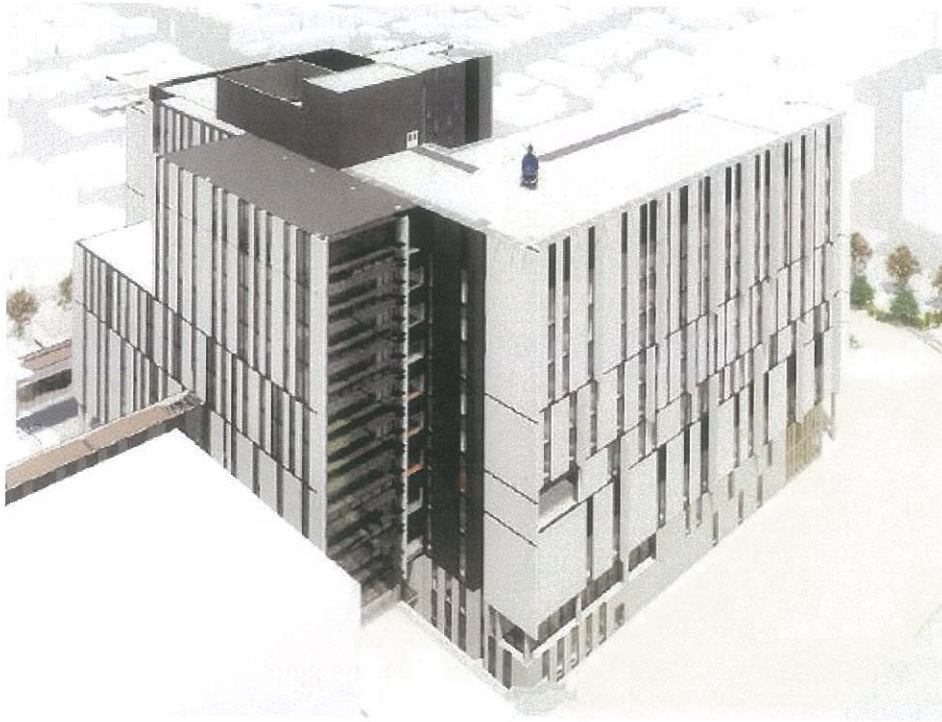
Northern elevation massing view of proposed ASB (Source: BVN, 2019)
